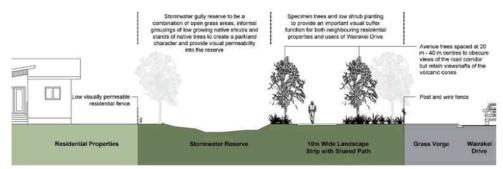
A: Cross section illustrating the Wairakei Drive road frontage design
